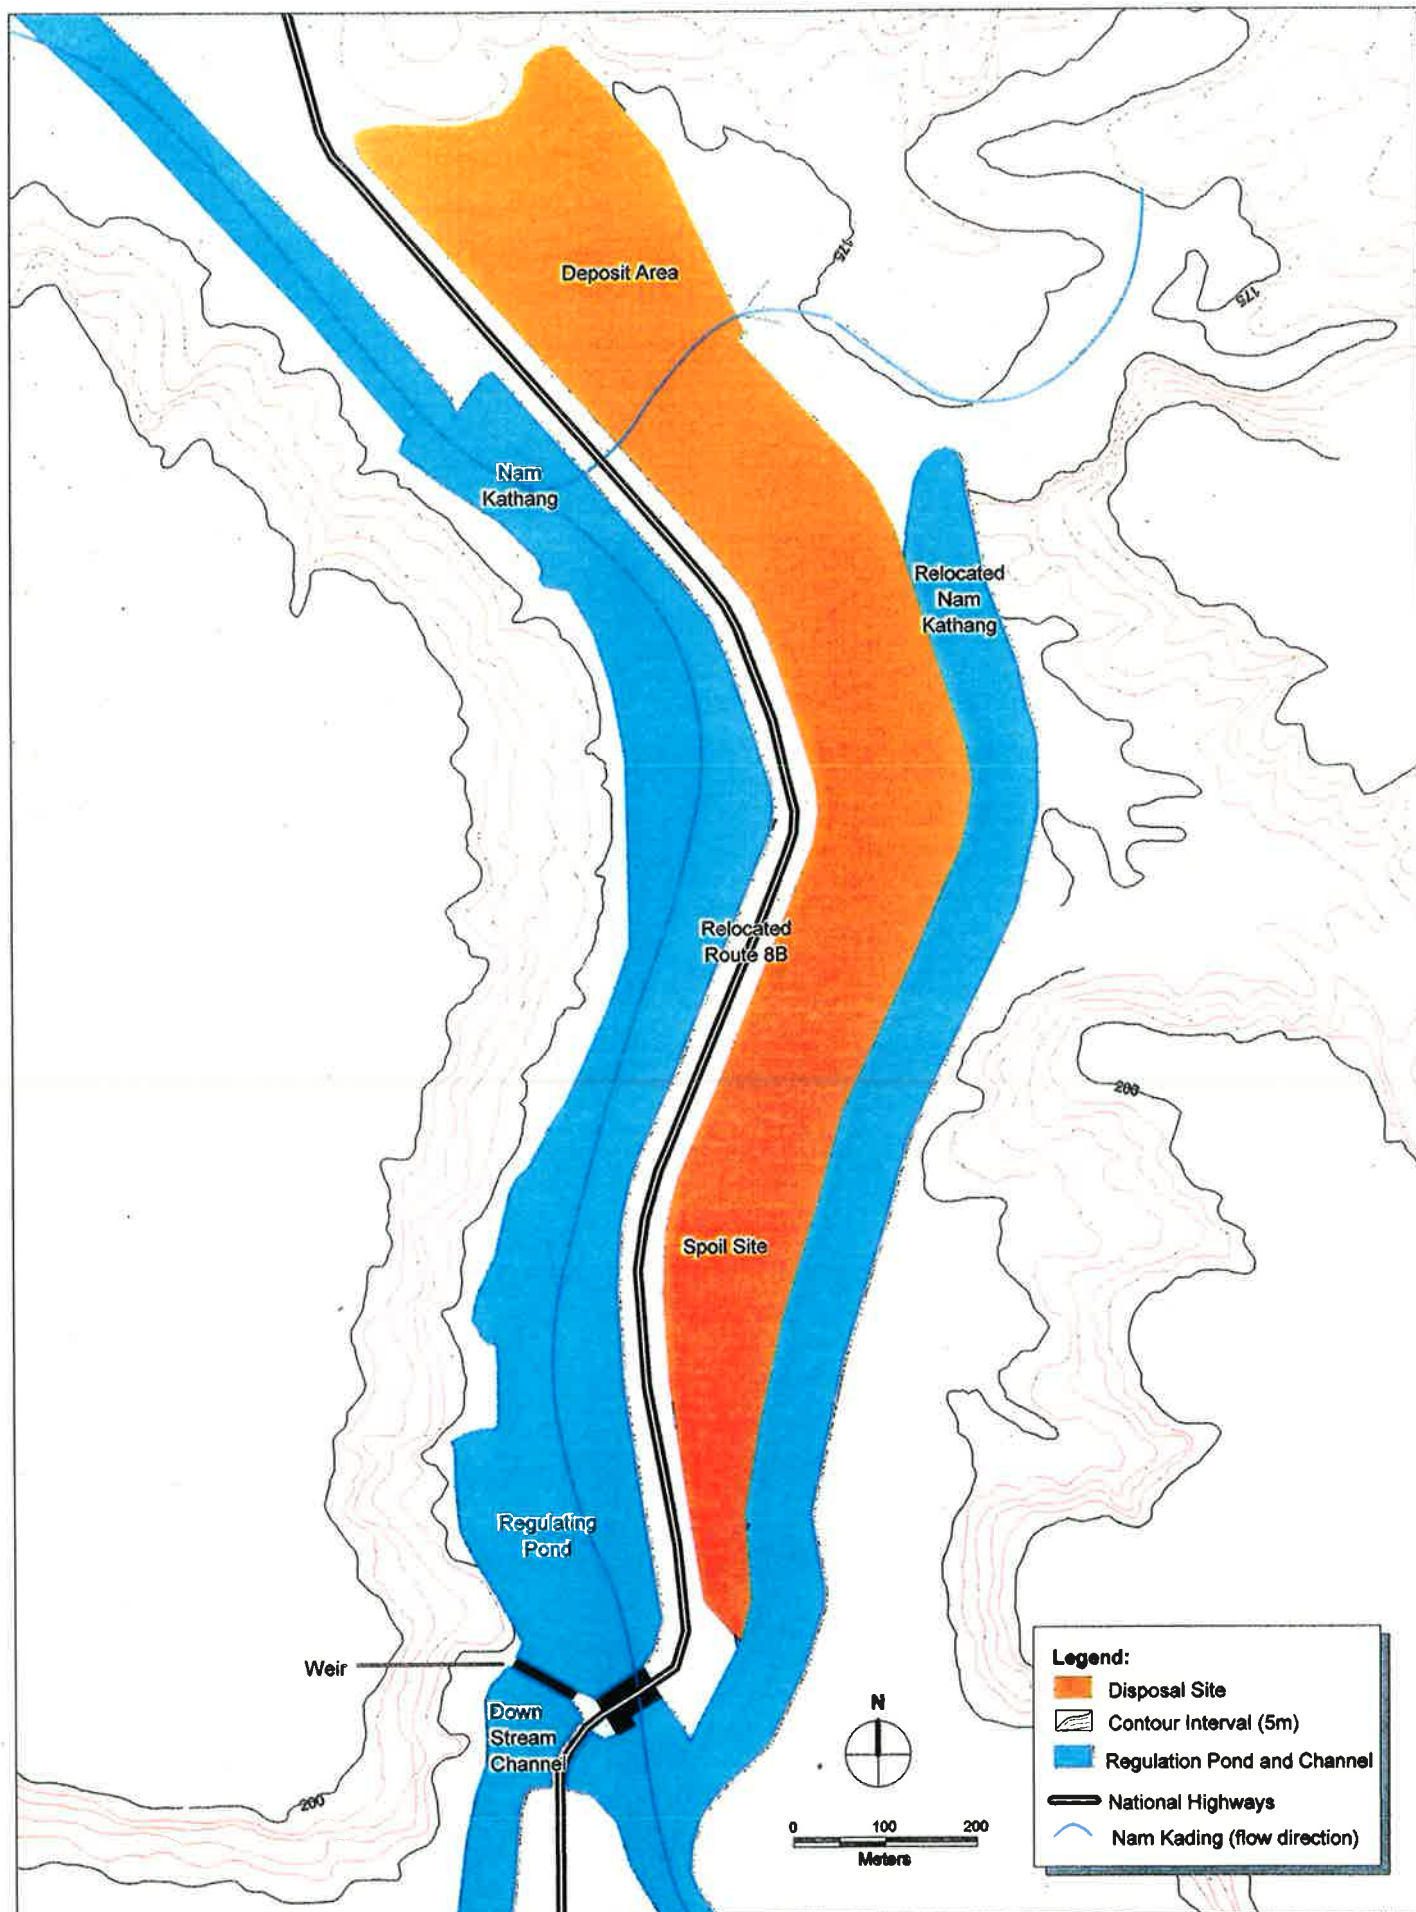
REGULATION POND AND WEIRS PLAN
